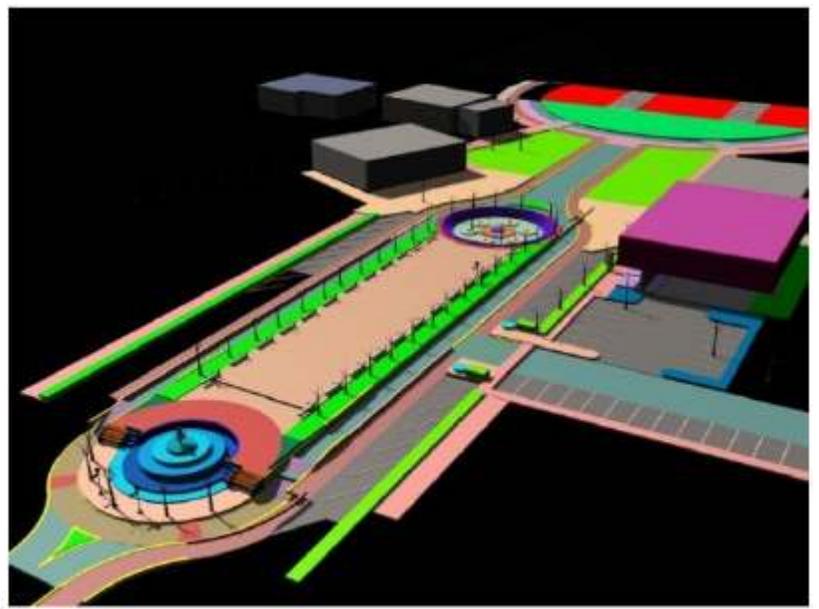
Nm516-US550 Crossing: urban design and master plan proposal: from a traditional intersection to the *highway as a shared public space
